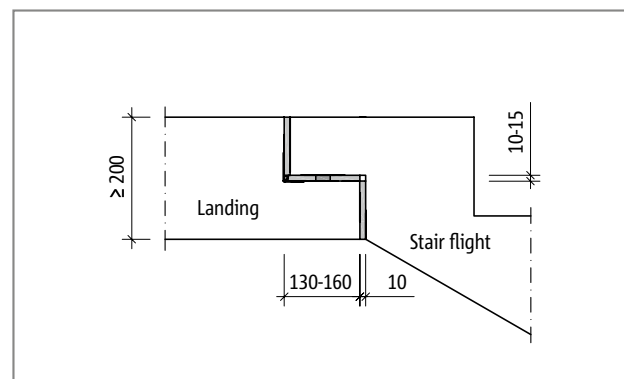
Schöck Tronsole® type F: Design variant flush stair connection
